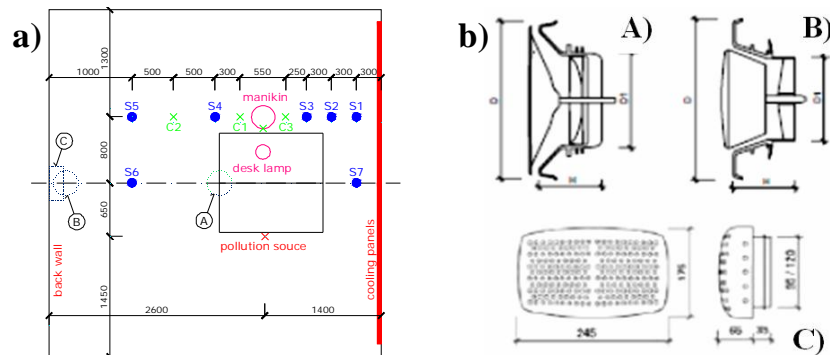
a) Experimental room set up with locations of measurement points and supply/exhaust devices; b) drawing of supply/exhaust used devices (A- supply at the ceiling, B – exhaust at the ceiling, C – supply/exhaust on the wall)
